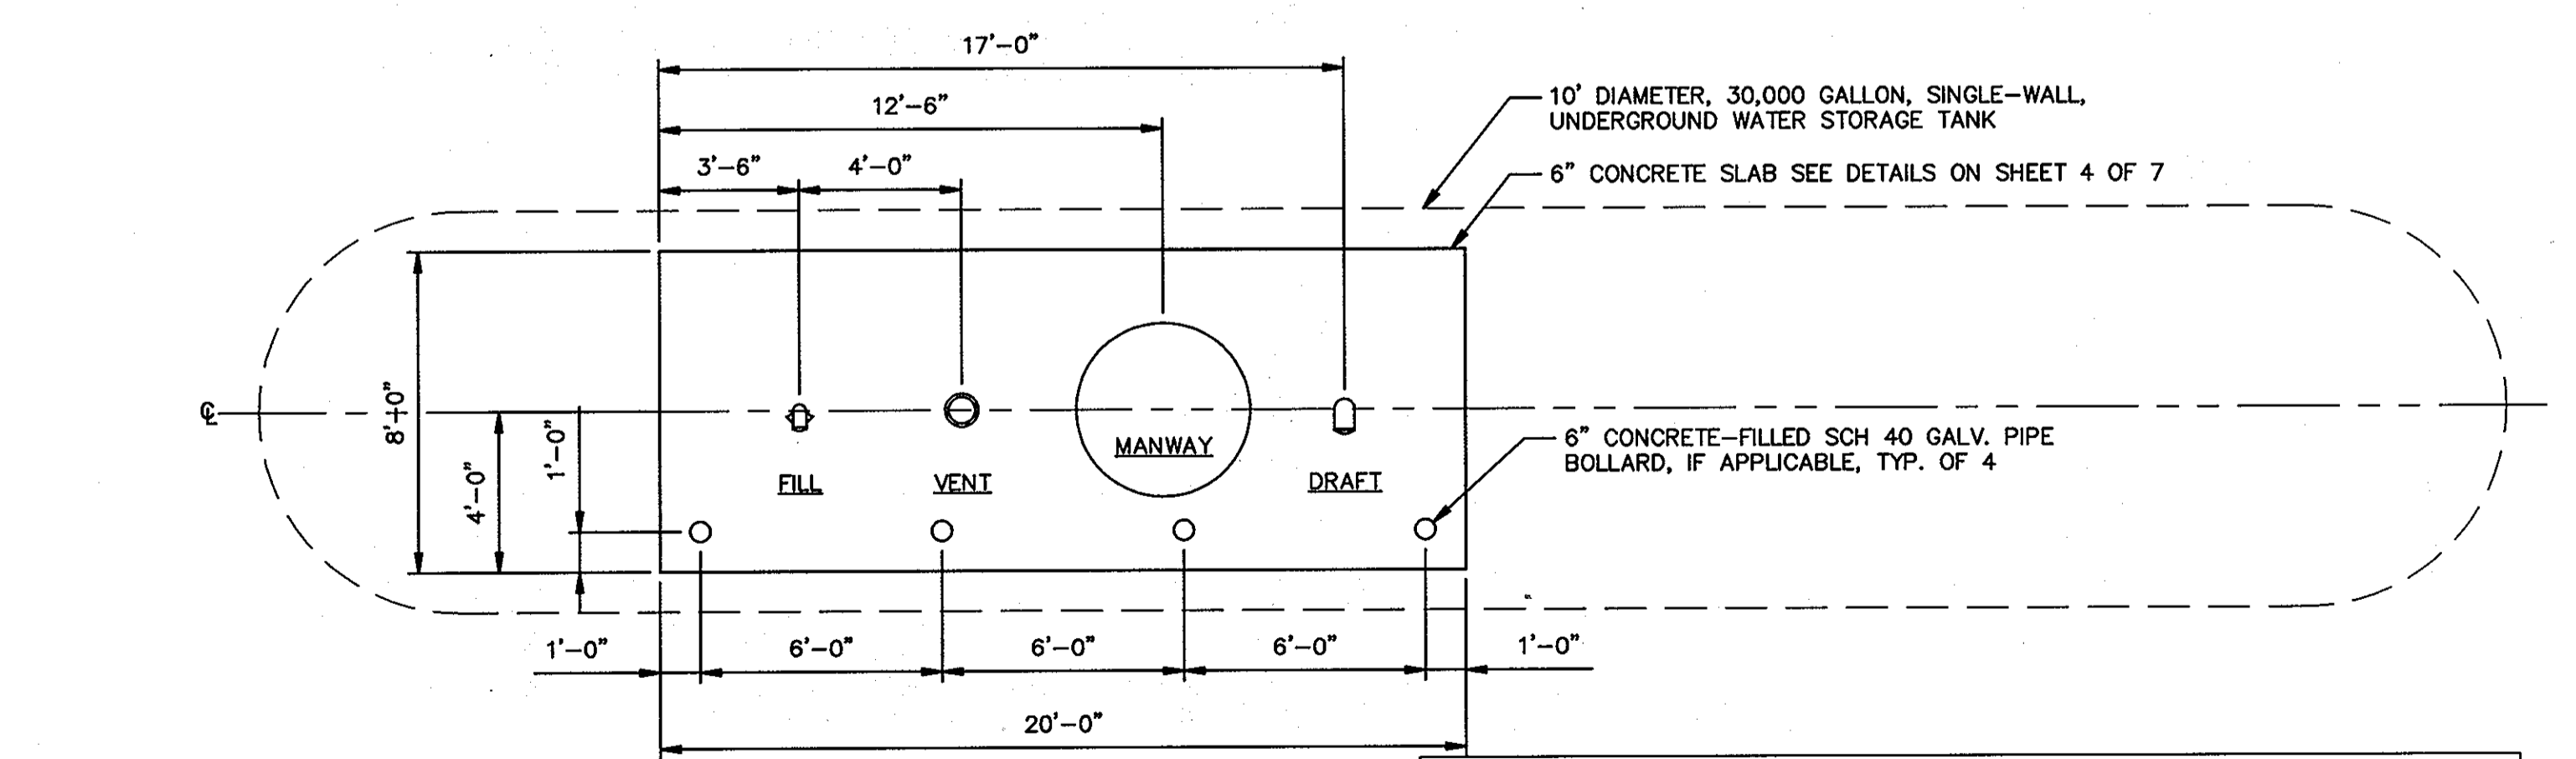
DETAIL: CONCRETE SLAB TYPICAL SECTION
